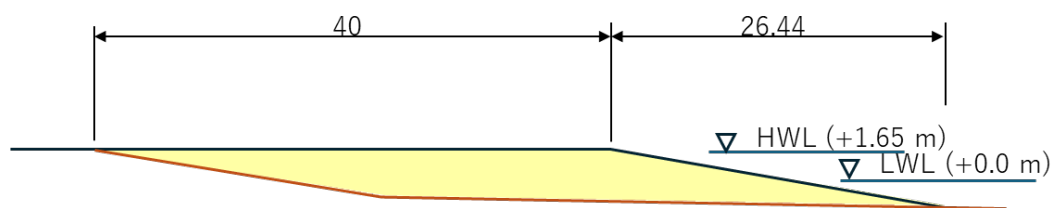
Typical Cross Section of Beach Nourishment in Tuban
